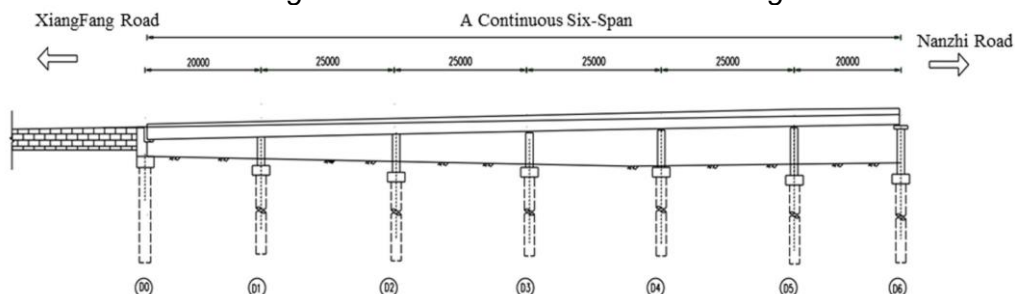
Bridge elevation layout diagram (unite: mm)
